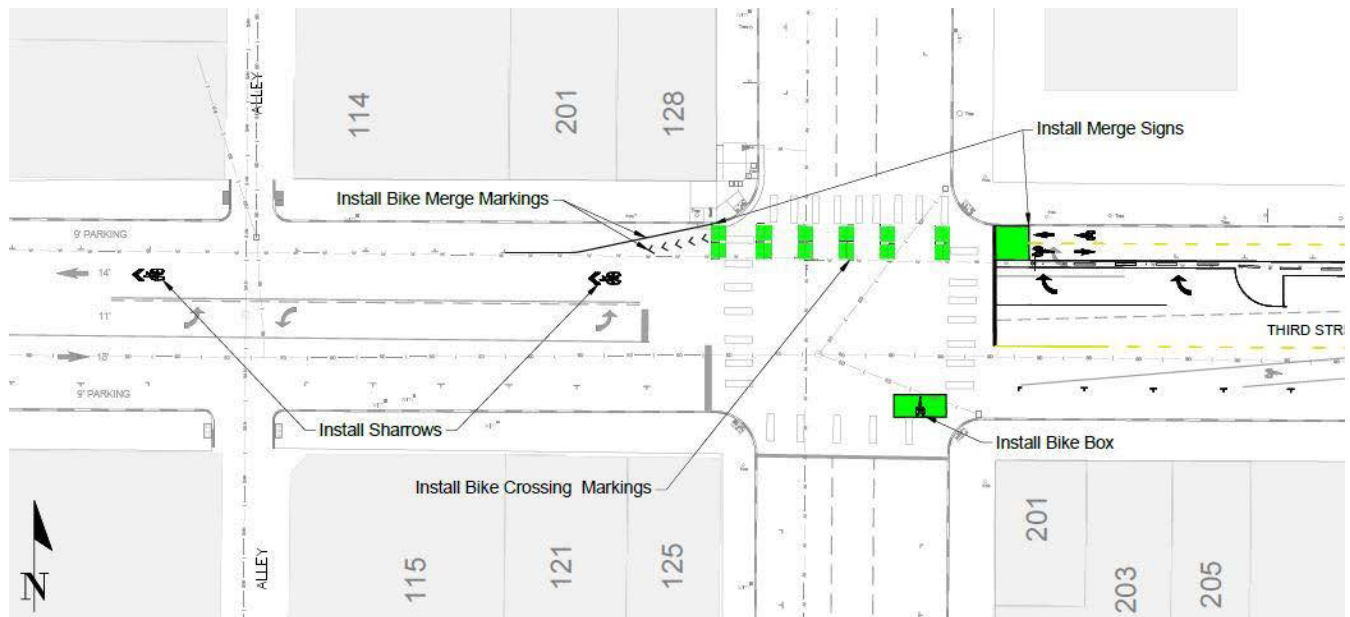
Washington Street transition from two-way protected bikeway to shared travel lanes.
